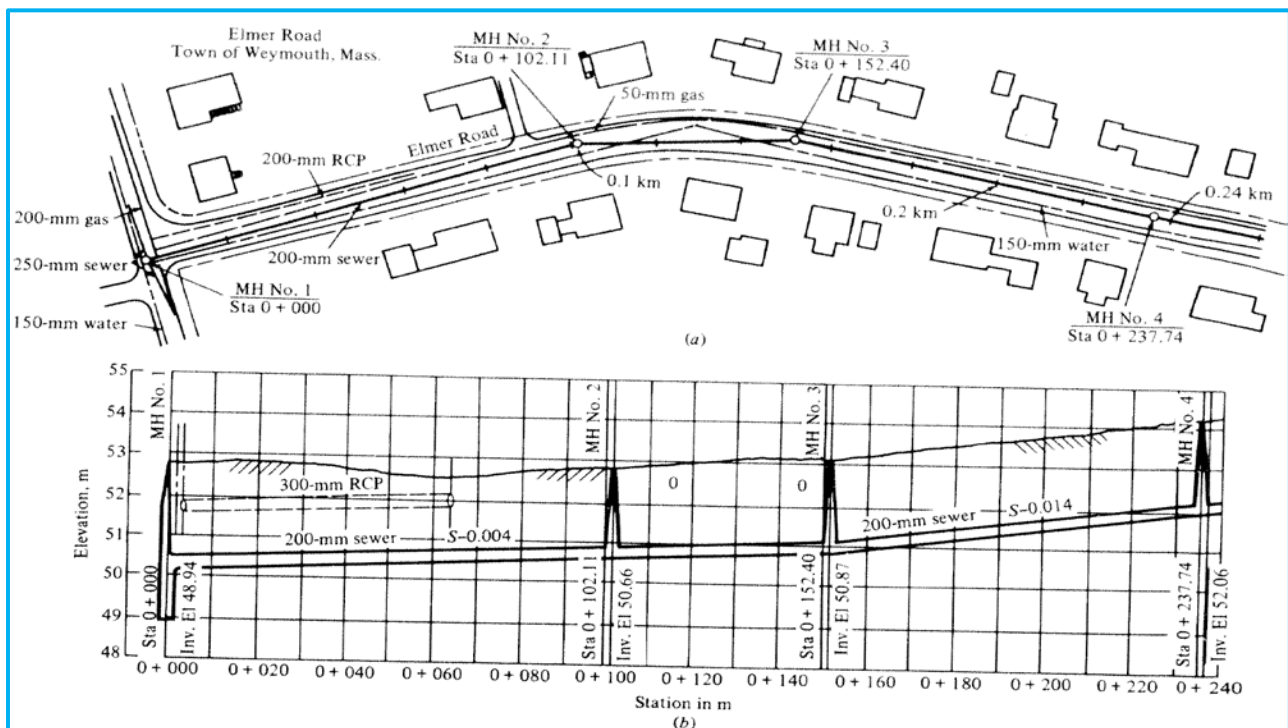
Typical (a) plan and (b) profile view of a sewer line¹.
